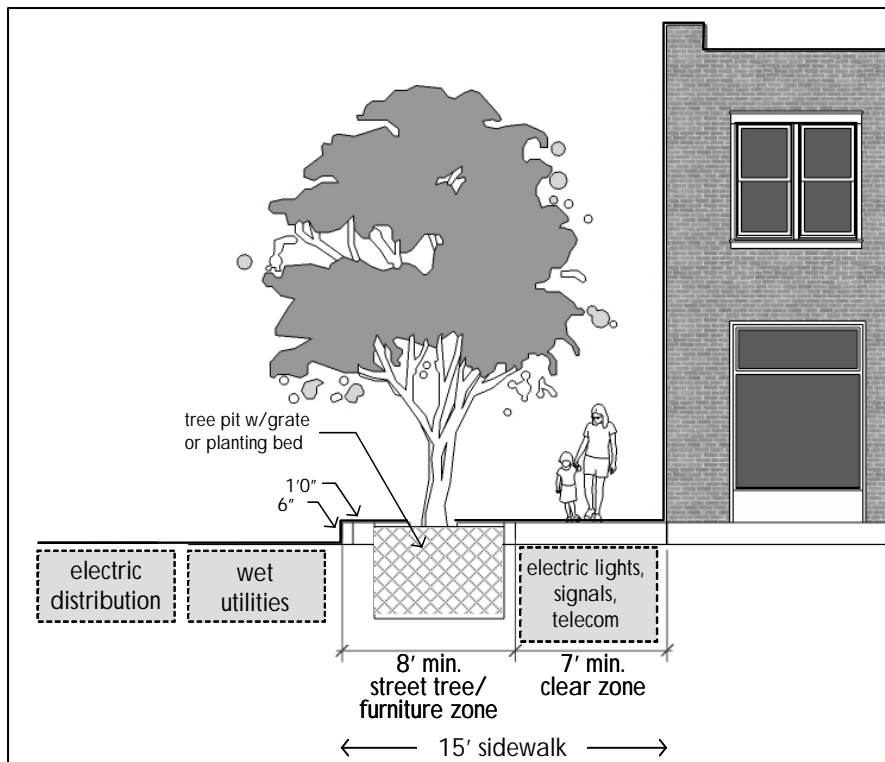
TOD Core Transit Corridor with underground utilities.
